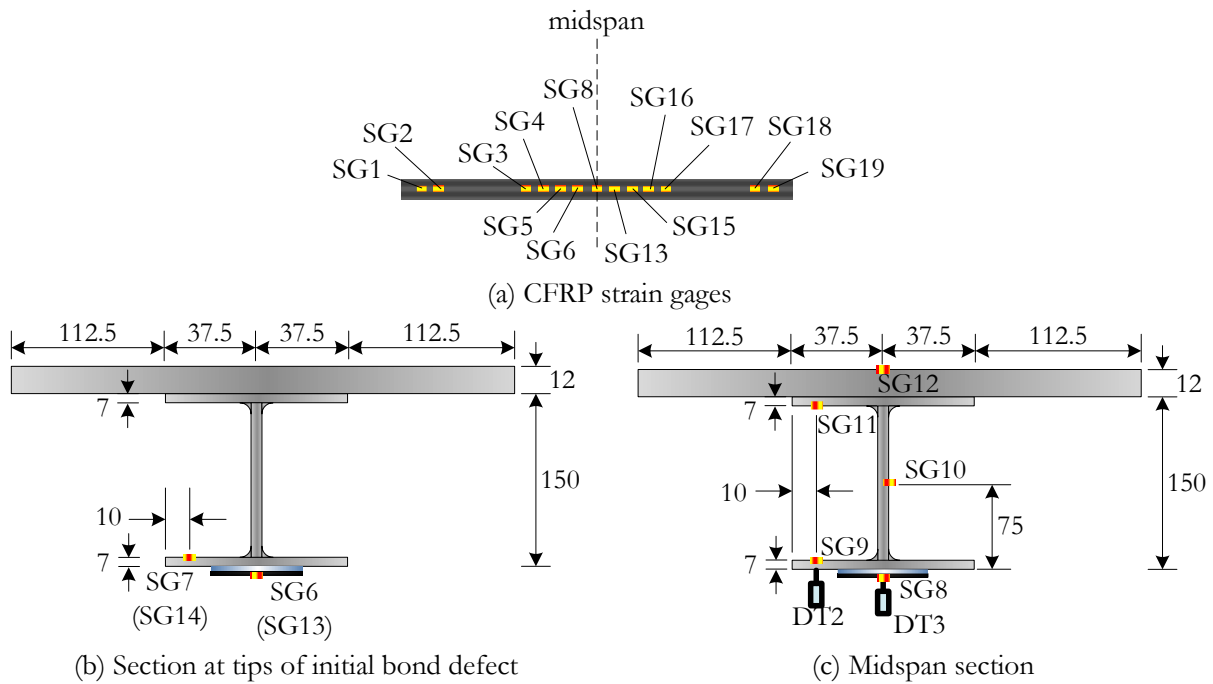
Details of instrumentation on CFRP plate and steel beam (all dimensions in mm).
